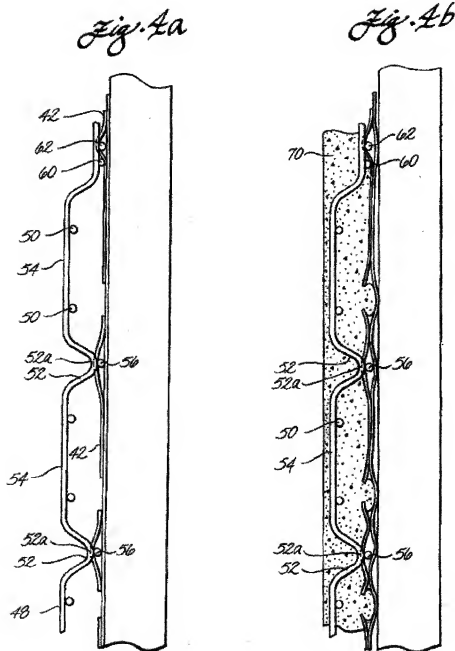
Cross-section of welded wire lathing as disclosed in US Patent 5,540,023 by Jaenson.
